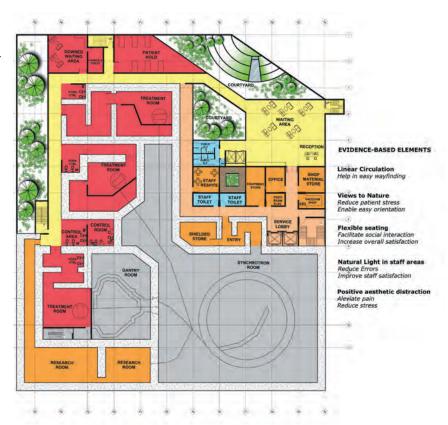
First-floor plan: Procedure and equipment areas were designed below ground level to use the earth around the building as a natural shield for radiation. The layout of the equipment room was based on the latest concept of locating the ion source and the linear accelerator within the circumference of the synchrotron ring, thereby decreasing the amount of space required. A horizontal beam treatment room, an angular room, and one with a gantry were designed to illustrate different room types.
